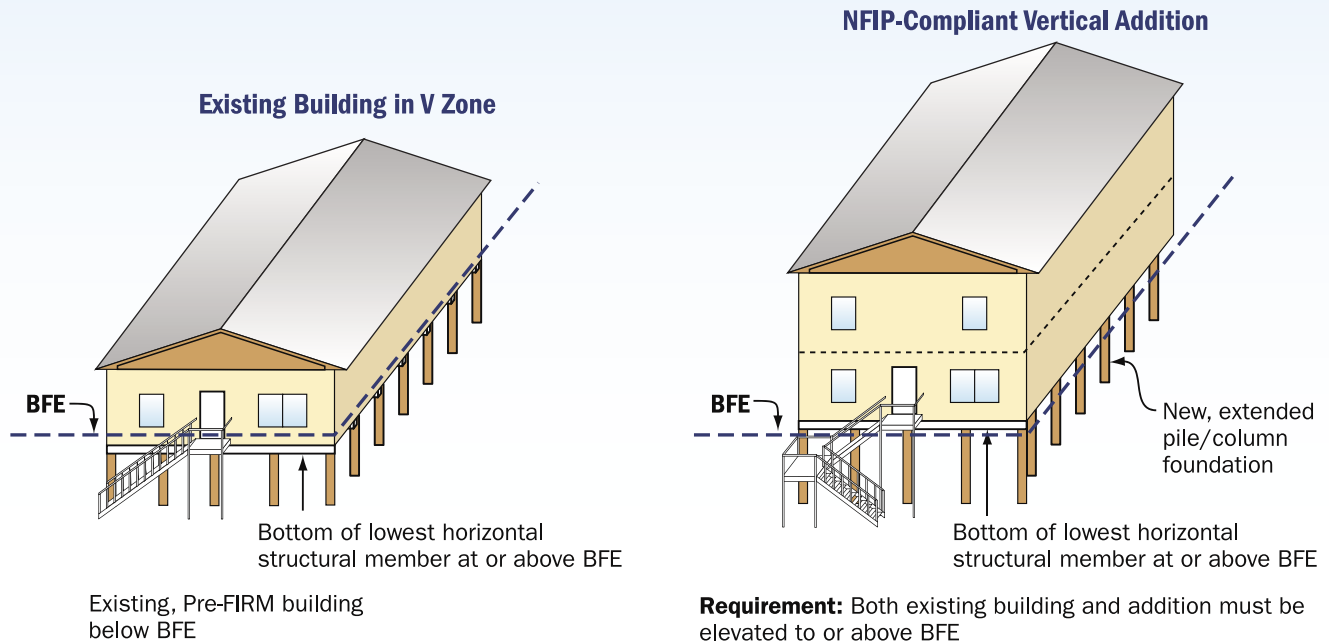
Substantial improvement: Vertical addition to a pre-FIRM building in a V zone.
